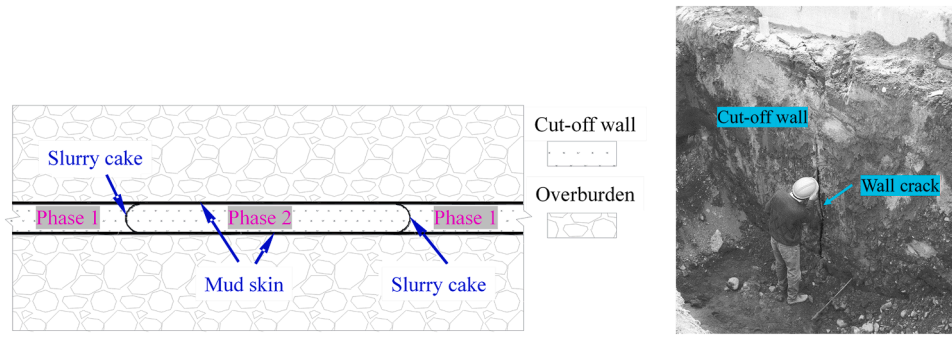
Cracks in the groove section of the cut-off wall. (a) Schematic diagram of the mud skin surrounding the cut-off wall and the crack in the cut-off wall [26] and (b) crack in the Arminou dam cut-off wall [11].
